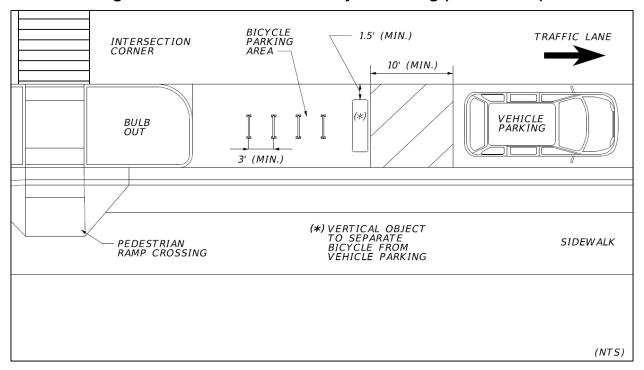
On-Street Bicycle Parking (Intersection)
